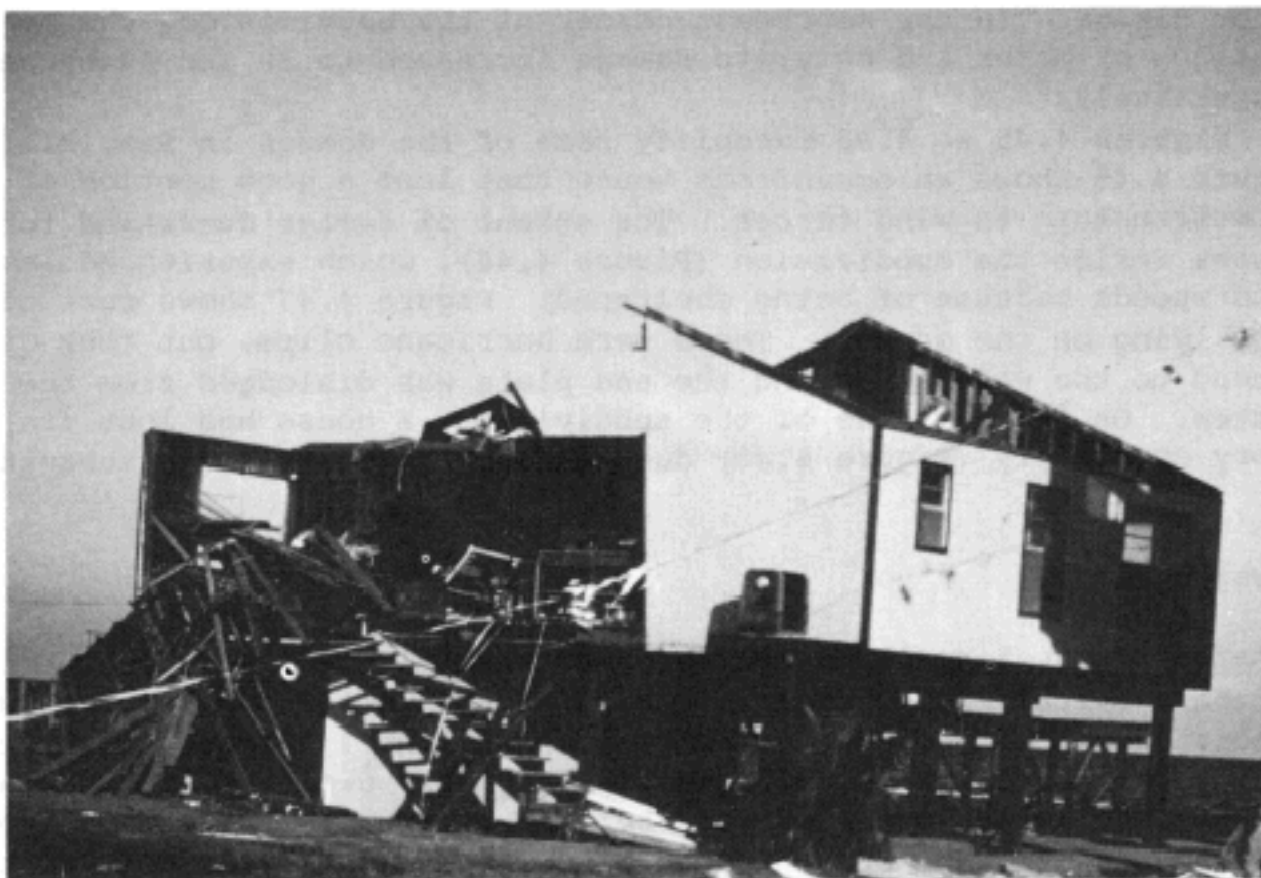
Damaged house fronting the Gulf in Sea Isle.
